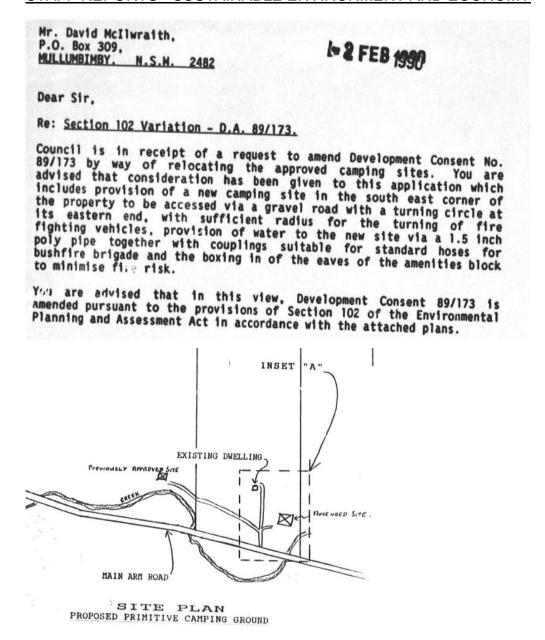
Site plan for DA 5.1989.173.1 – Primitive Camping Ground
